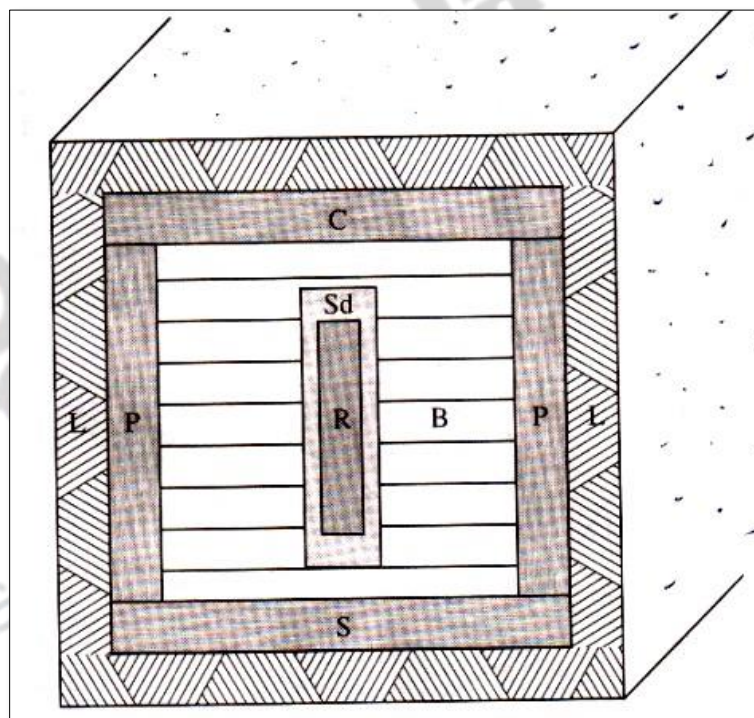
Different support elements for underground soft ground tunneling. L - Lagging, S- Sill or Strut, C- Cap, P- Post, Sd- Soldier, R- Raker and B- Breasting.
